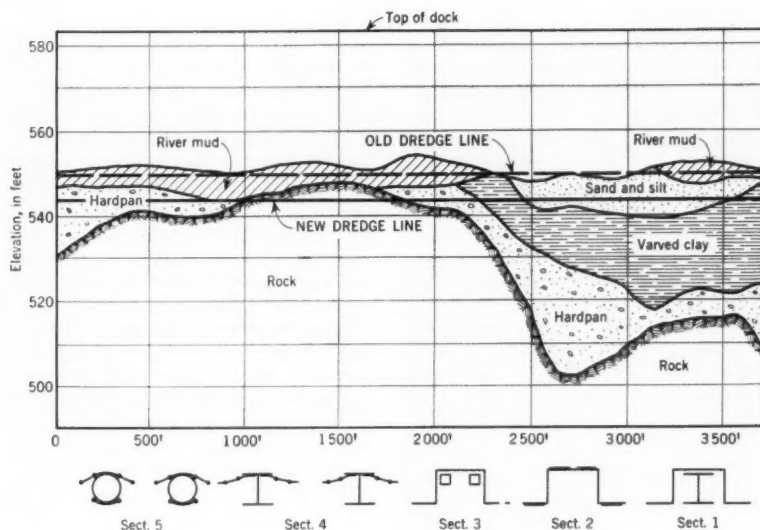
Elevation of rock surface along dock wall varies from El. 500 to 548. Varved clay stratum at right presented most serious problem. To meet varying conditions, five types of wall design were used, as indicated along base of profile.
